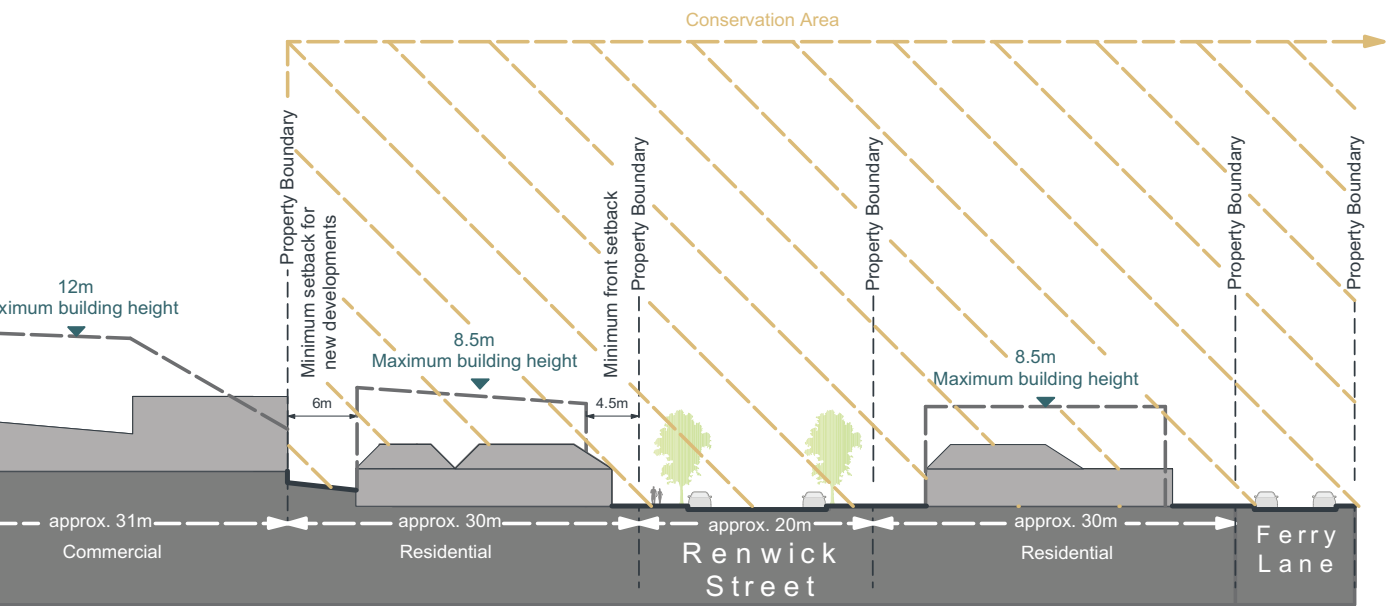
Section C through Victoria Road, looking north-west (eastern side)
